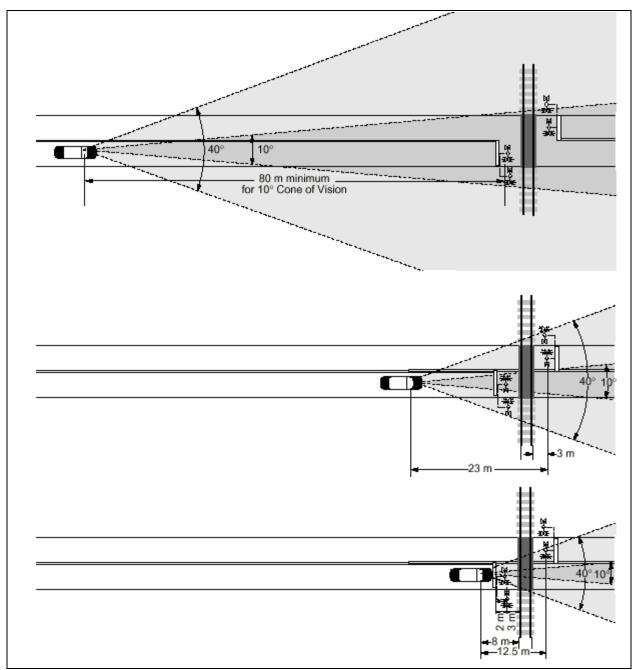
Horizontal Cone of Vision (Part B – Design Standards, RTD 10 Road Railway Grade Crossings, Draft, March 7, 2002)
